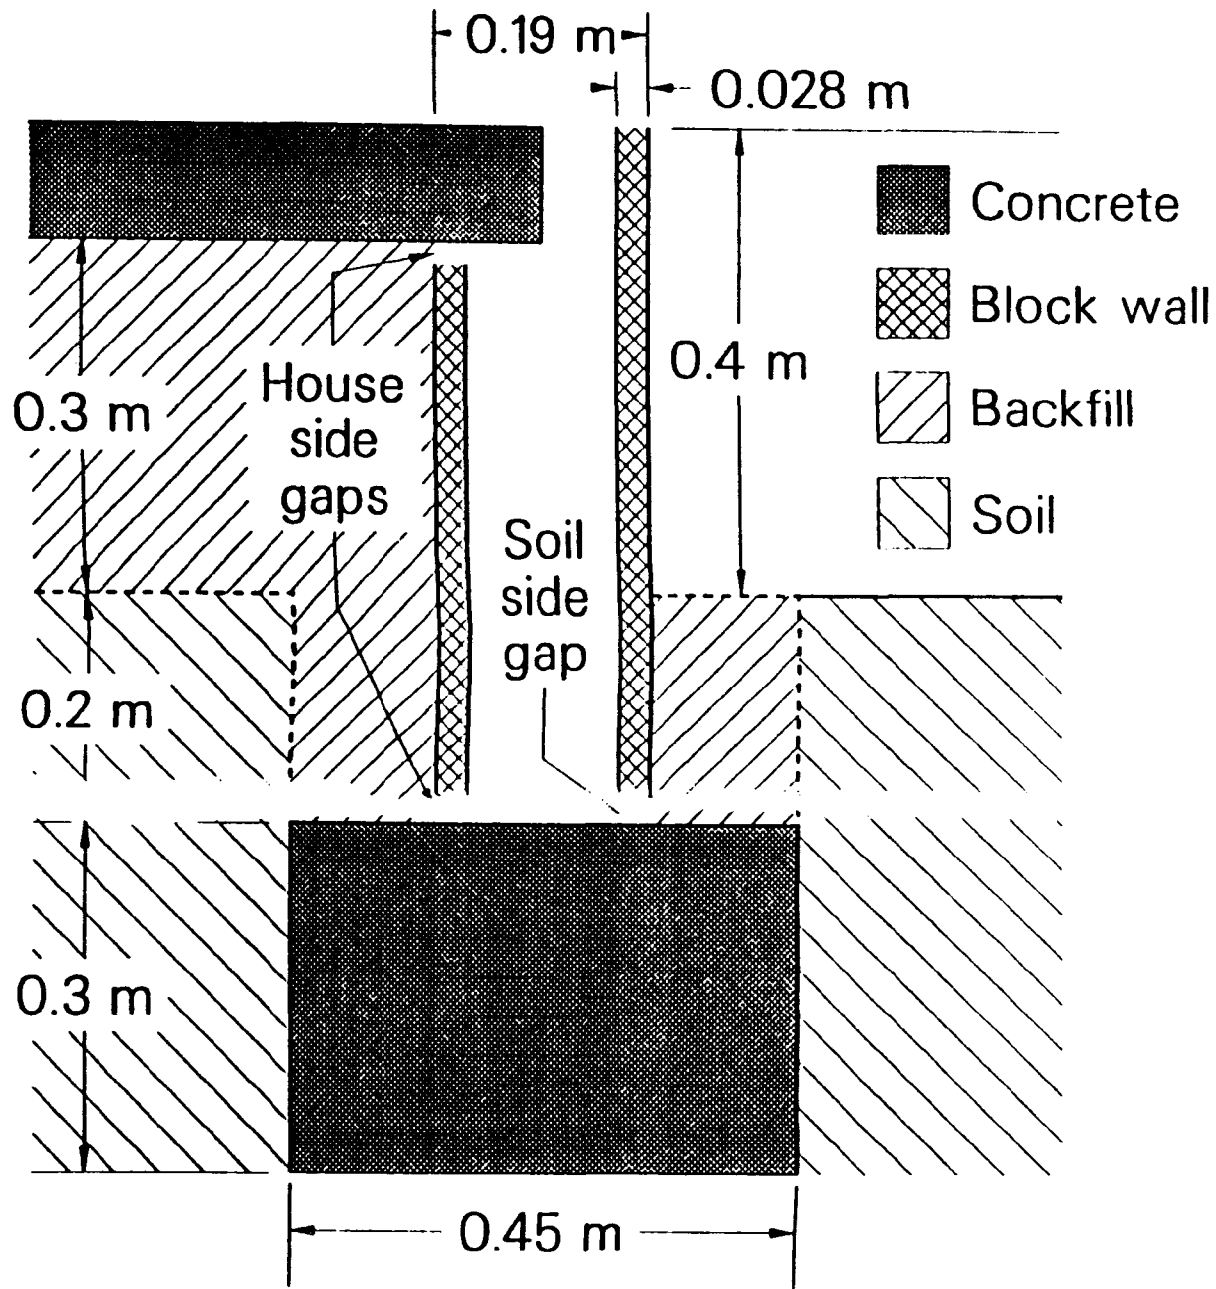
Detail of the stem wall, showing the fixed dimensions for the wall height, dimensions of the footing, and fill depth and location with respect to the footing. The size of the gaps at the top and bottom of the stem wall is exaggerated in this diagram. In the base case, their widths are 3 mm. The floor slab thickness is 10 cm.
